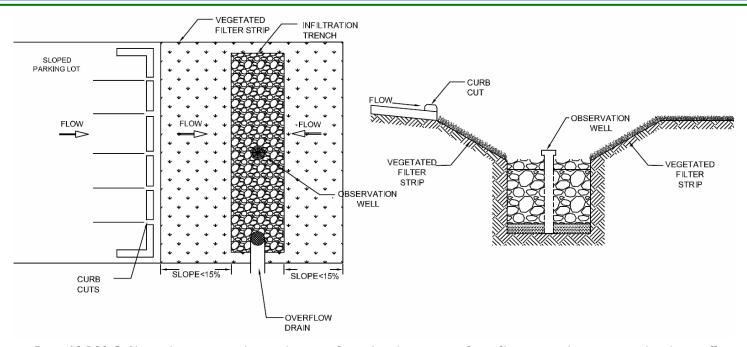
C. Plan and cross-sectional view schematic of typical implementation of an infiltration trench accepting parking lot runoff
